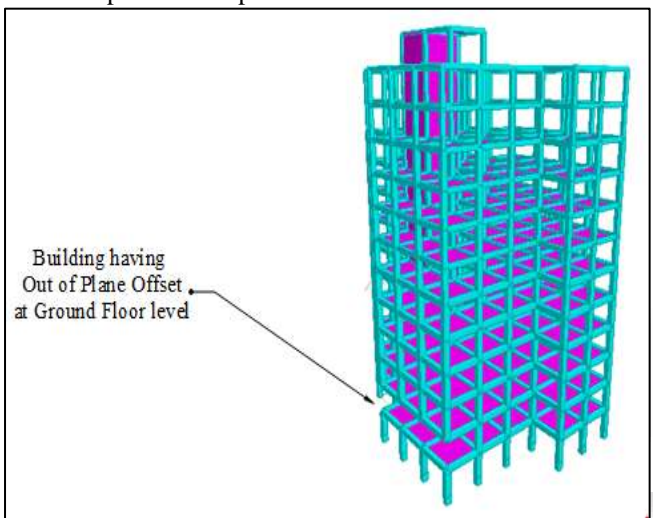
OPO Case 1.1 - Residential Apartment having out of plane offset provided at ground floor level.
